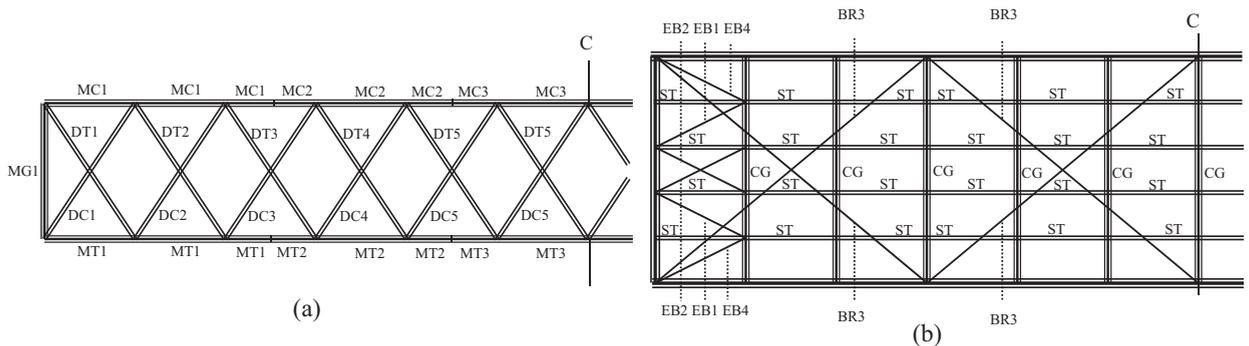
Member set categorization: (a) main truss girder, (b) horizontal bridge deck [3].
